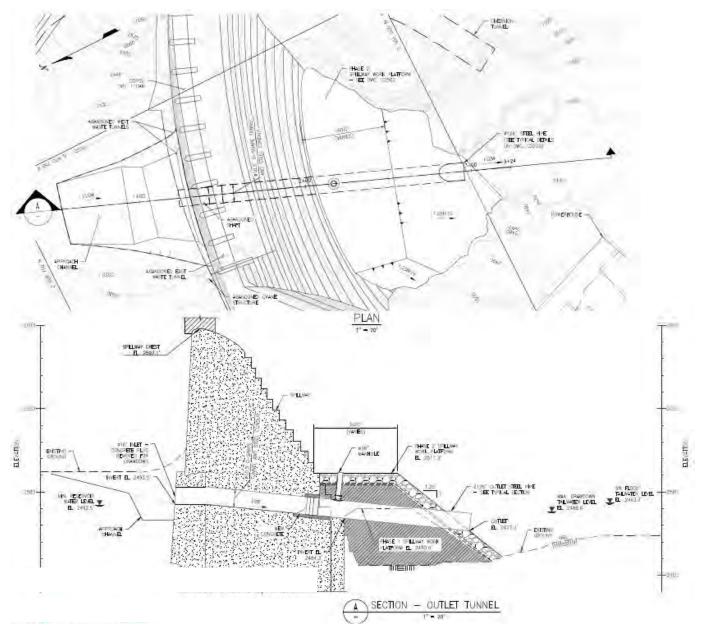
Plan view and section of proposed Copco No. 1 drawdown low-level outlet, KP Drawing C2205 (07/22/2020)
